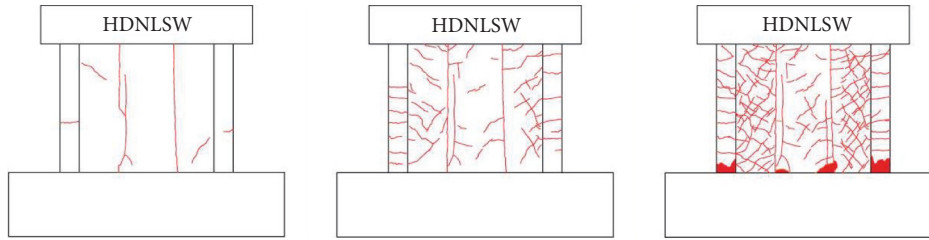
Crack development of the shear wall HDNLSW.
